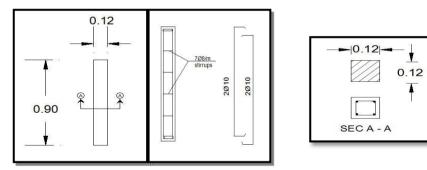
Concrete DimensionsAnd Reinforcement Details For Columns (C5, C6, C7 and C8)
